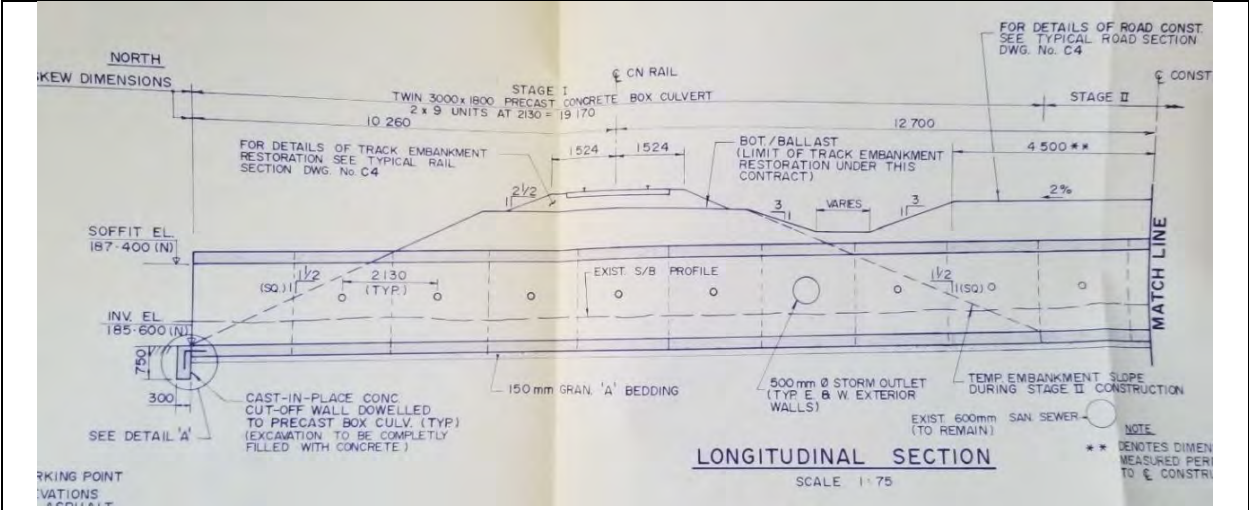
Railway Portion of the Longitudinal Section of the Twin Culvert
